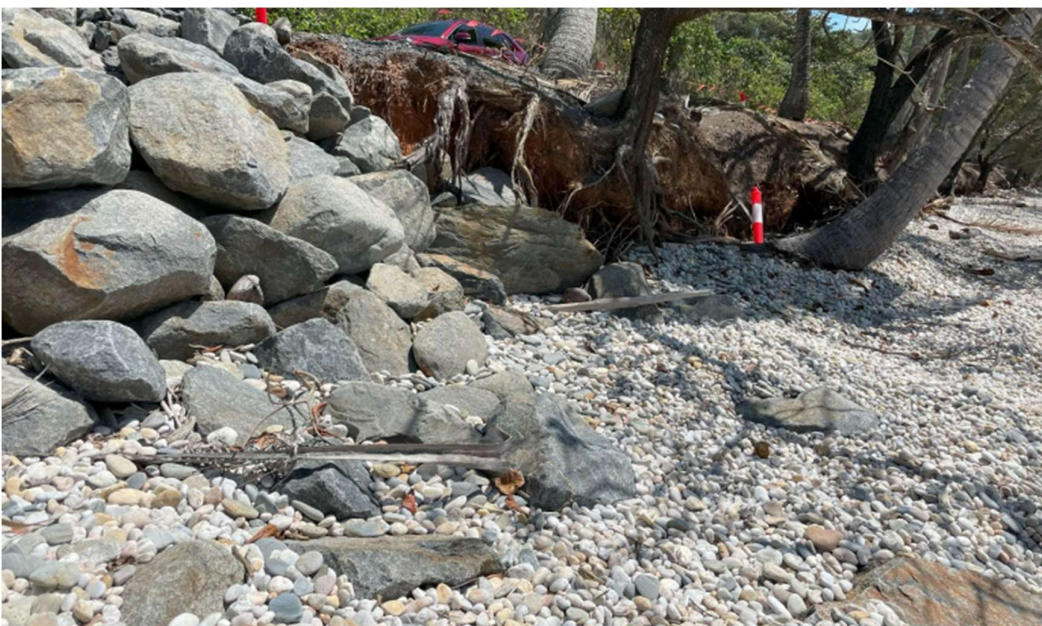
Pebble beach berm in front of eroded embankment and emergency rock wall
